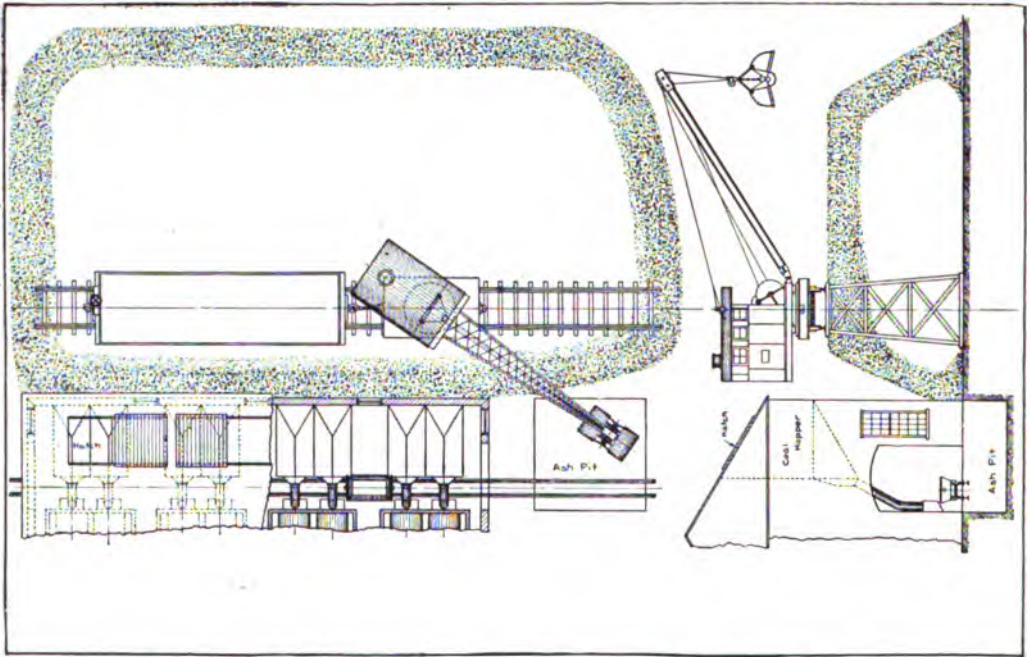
Coal and Ash Handling Scheme with Browning Travelling Crane.
